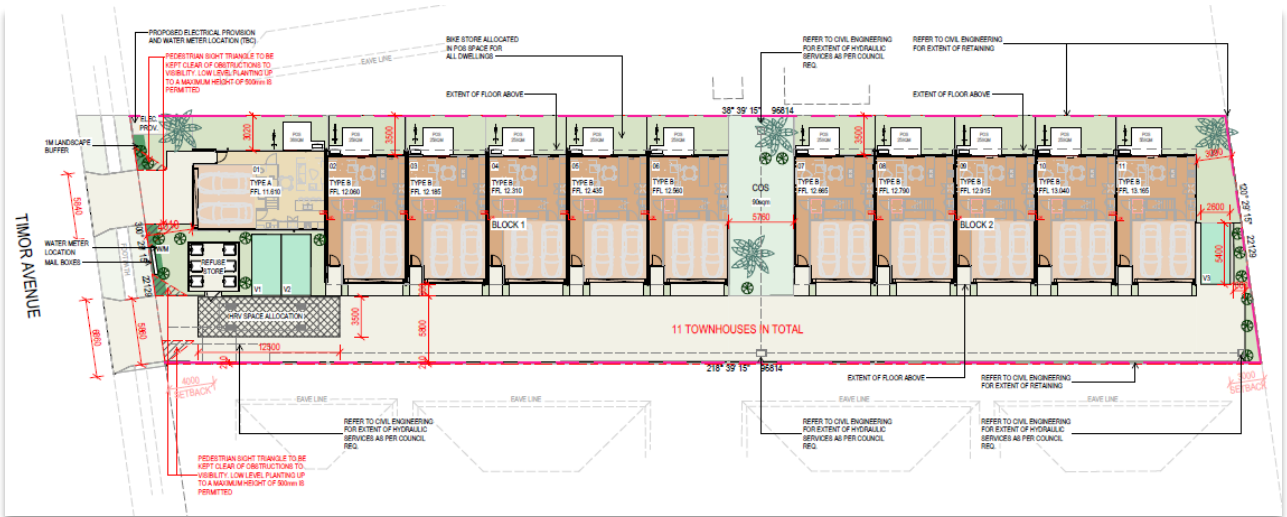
Extract From Proposed Site Plan (Source: MODE)
